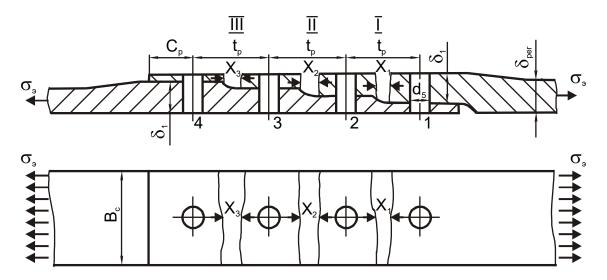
Design scheme and geometrical parameters of a multi-row shear bolted joint (bolt heads and nuts not shown)
